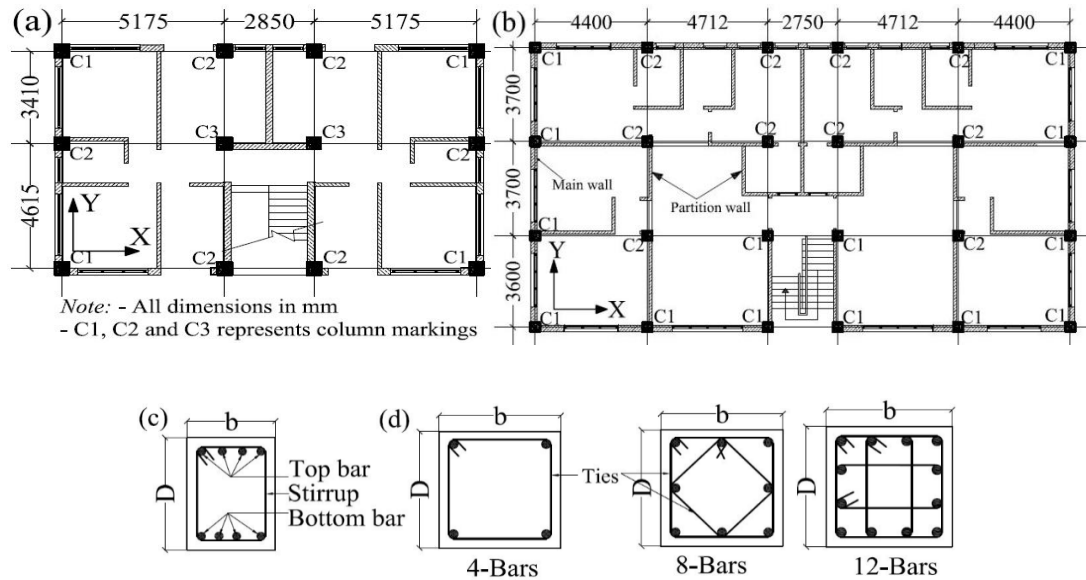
Column and masonry wall layout plan of (a) 6 storey and (b) 3 storey buildings. Reinforcement arrangement details of (c) beams and (d) columns.
